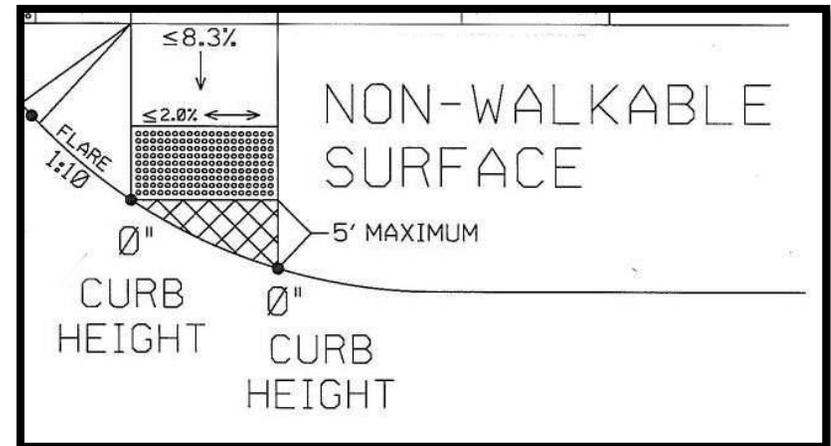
Dome Setback Adjacent to Non-Walkable Surface
